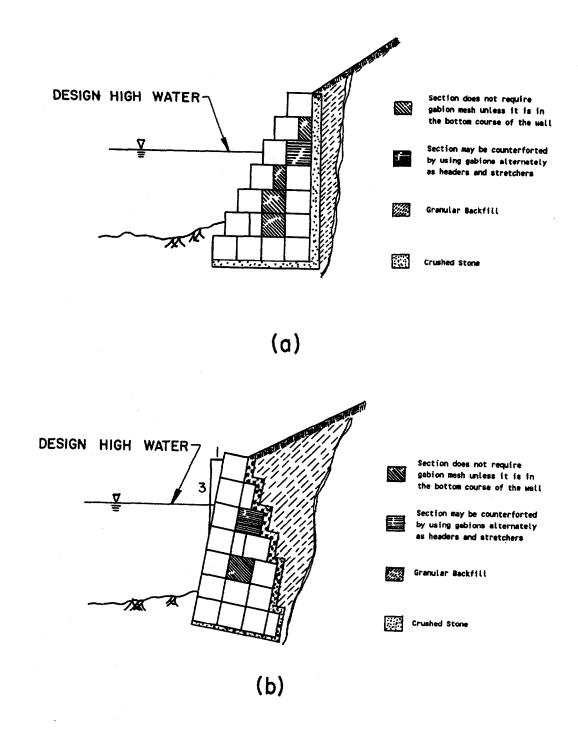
Section details for (a) stepped back and (b) battered gabion retaining walls. (see reference section A-A in figure 39).
